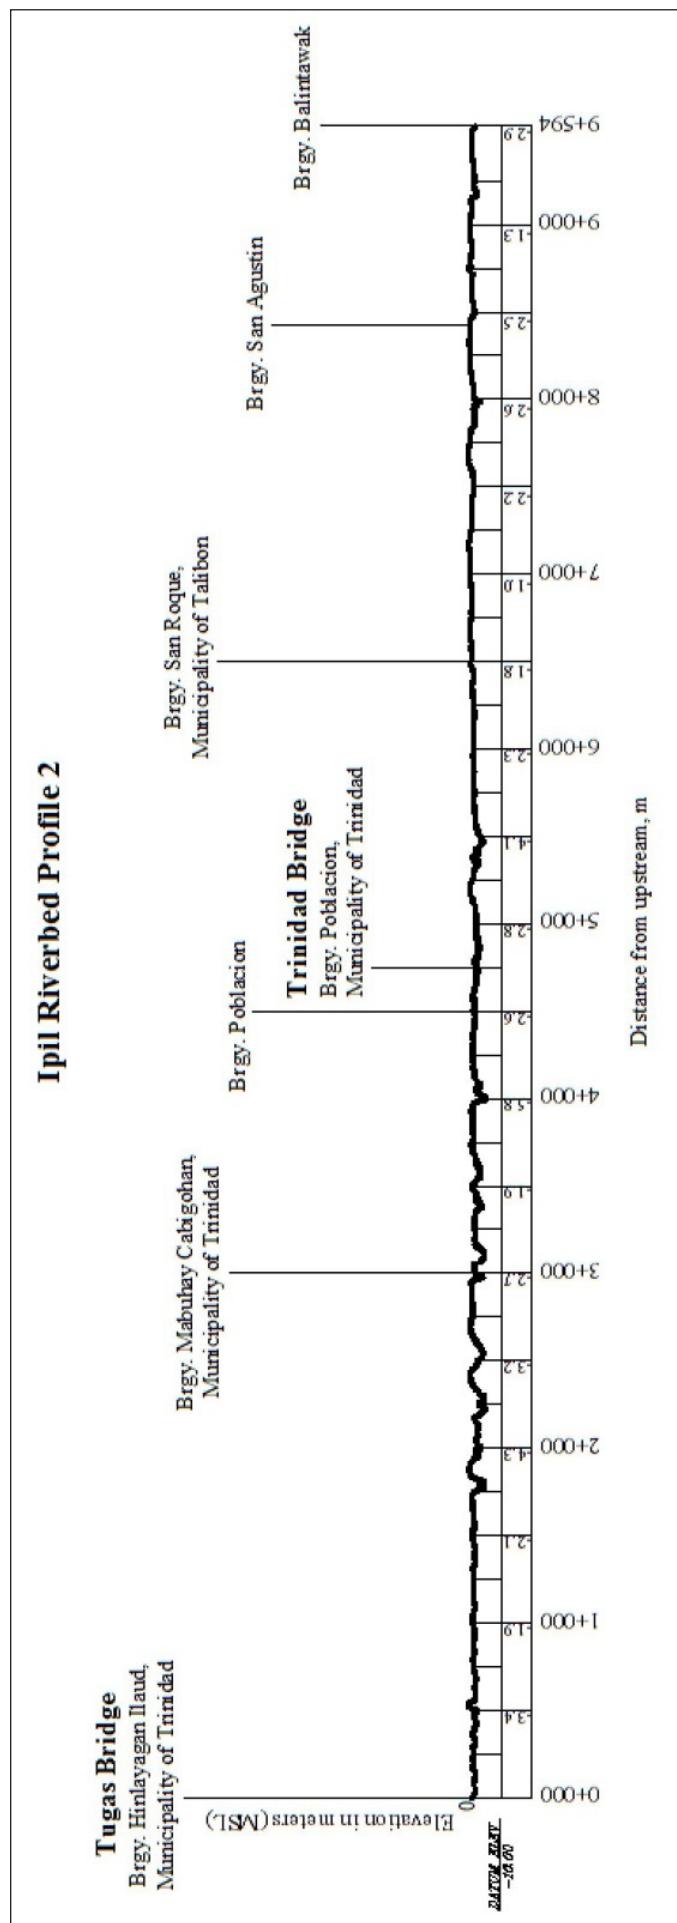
Ipil Riverbed Profile, from Tugas Bridge in Brgy. Hinlayagan Ilaud
